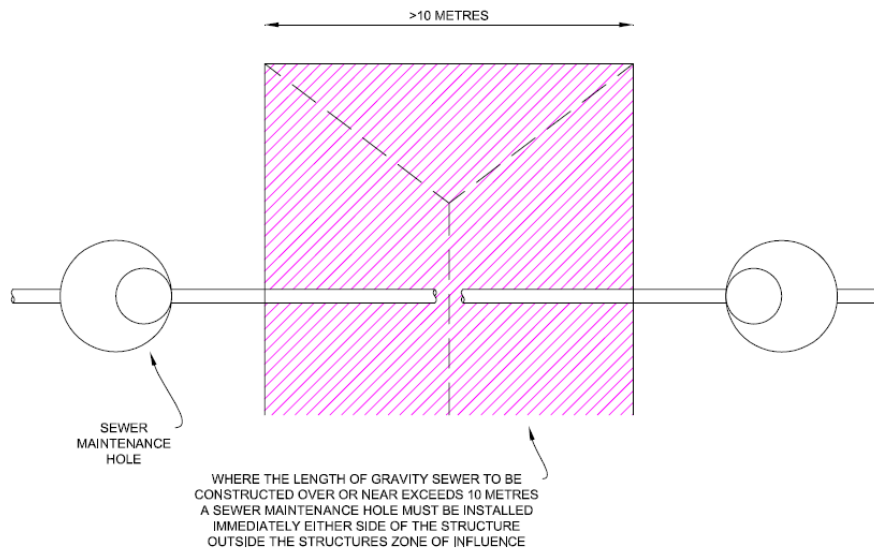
STRUCTURES OVER/NEAR A GRAVITY SEWER MAIN EXCEEDING 10 METRES
